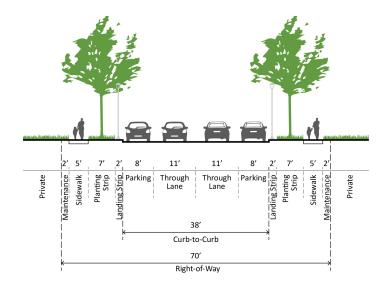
Proposed Typical Street Section for Waters House Avenue
